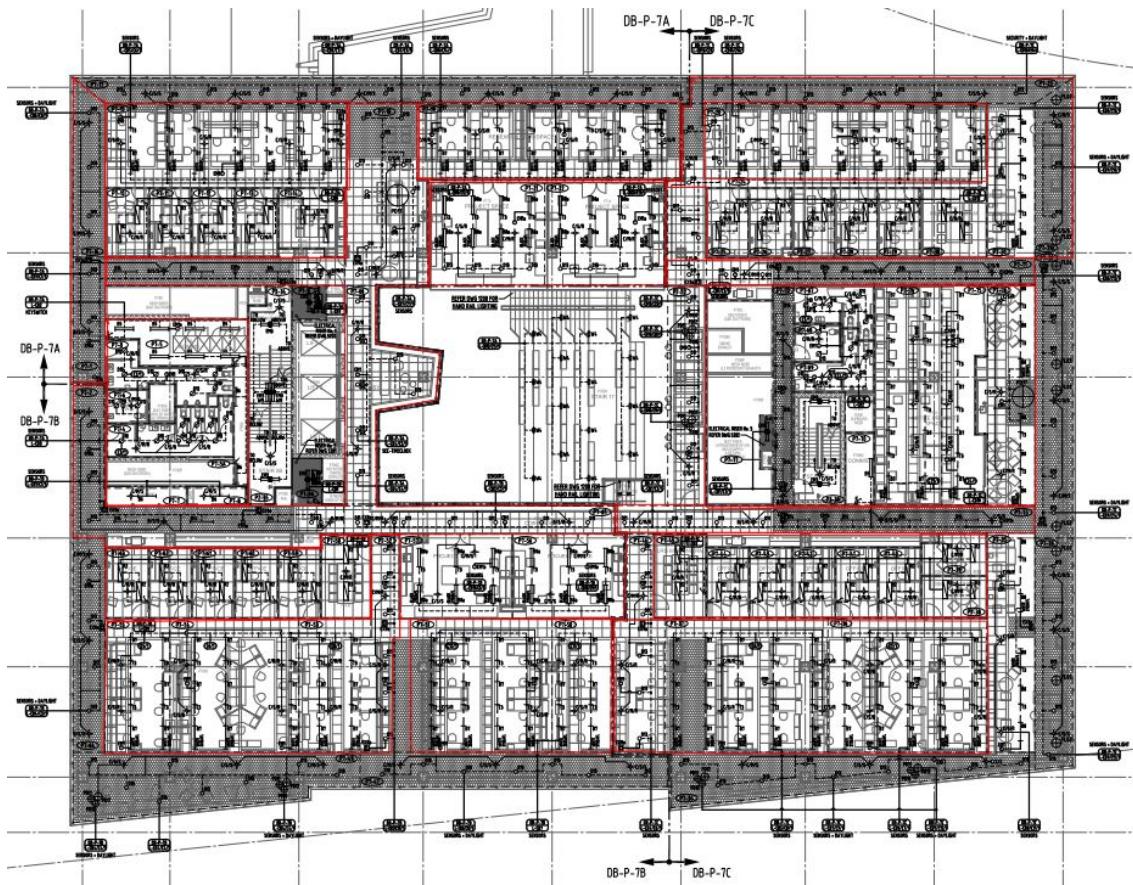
QUT Garden's Point Floor Layouts: P Block Level 7 Lighting Markup
